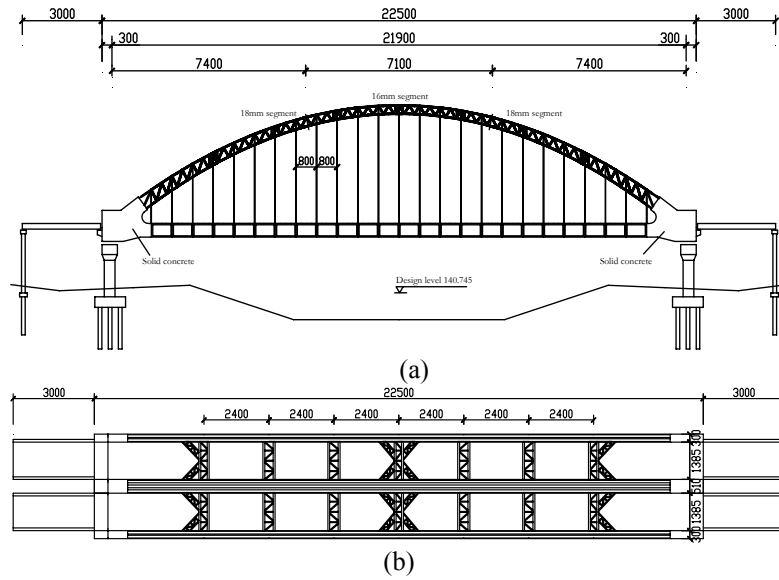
Schematic diagram of the Pushan Bridge (unit: cm): (a) Elevation, (b) Plane.
